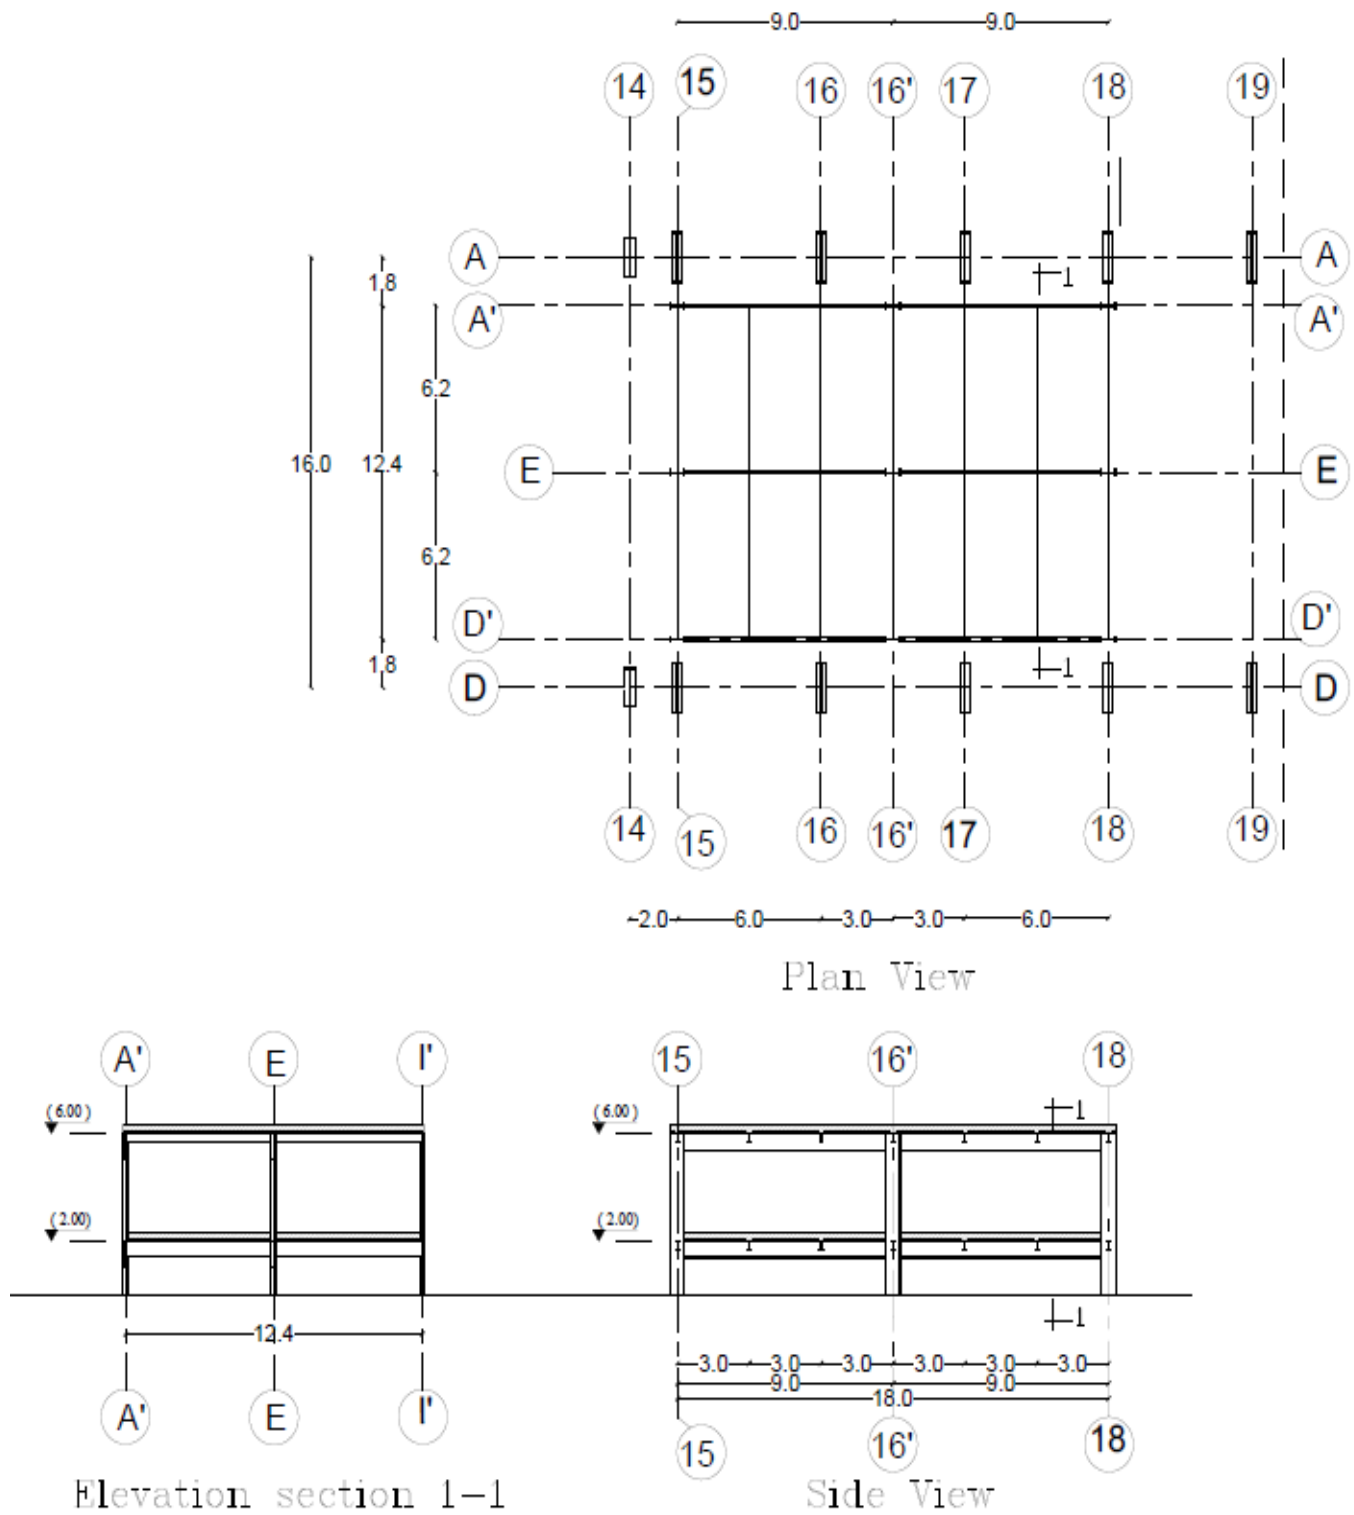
8 Layout of mezzanine part plan, side view & elevation
